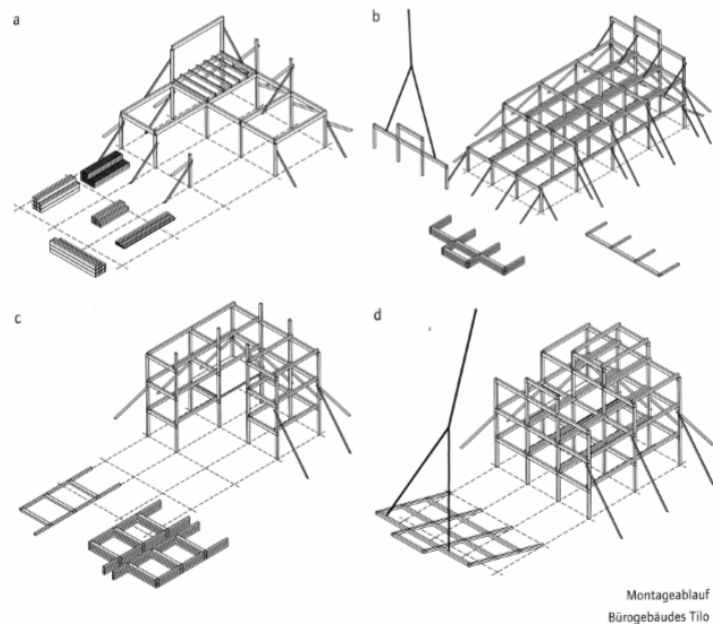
Isometrical view examples of timber skeleton engineering in multi-storey construction
